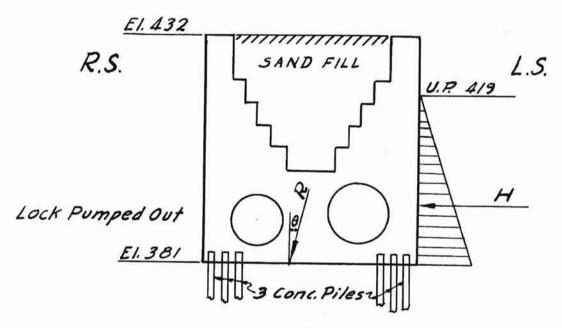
INTERMEDIATE WALL BETWEEN BAYS
